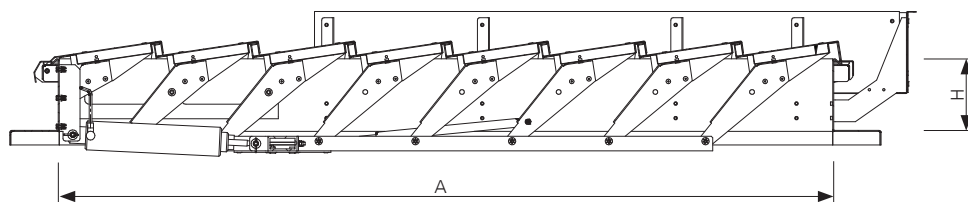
Section A-A of mcr LAM louvered smoke vent in closed position (roof installation)
